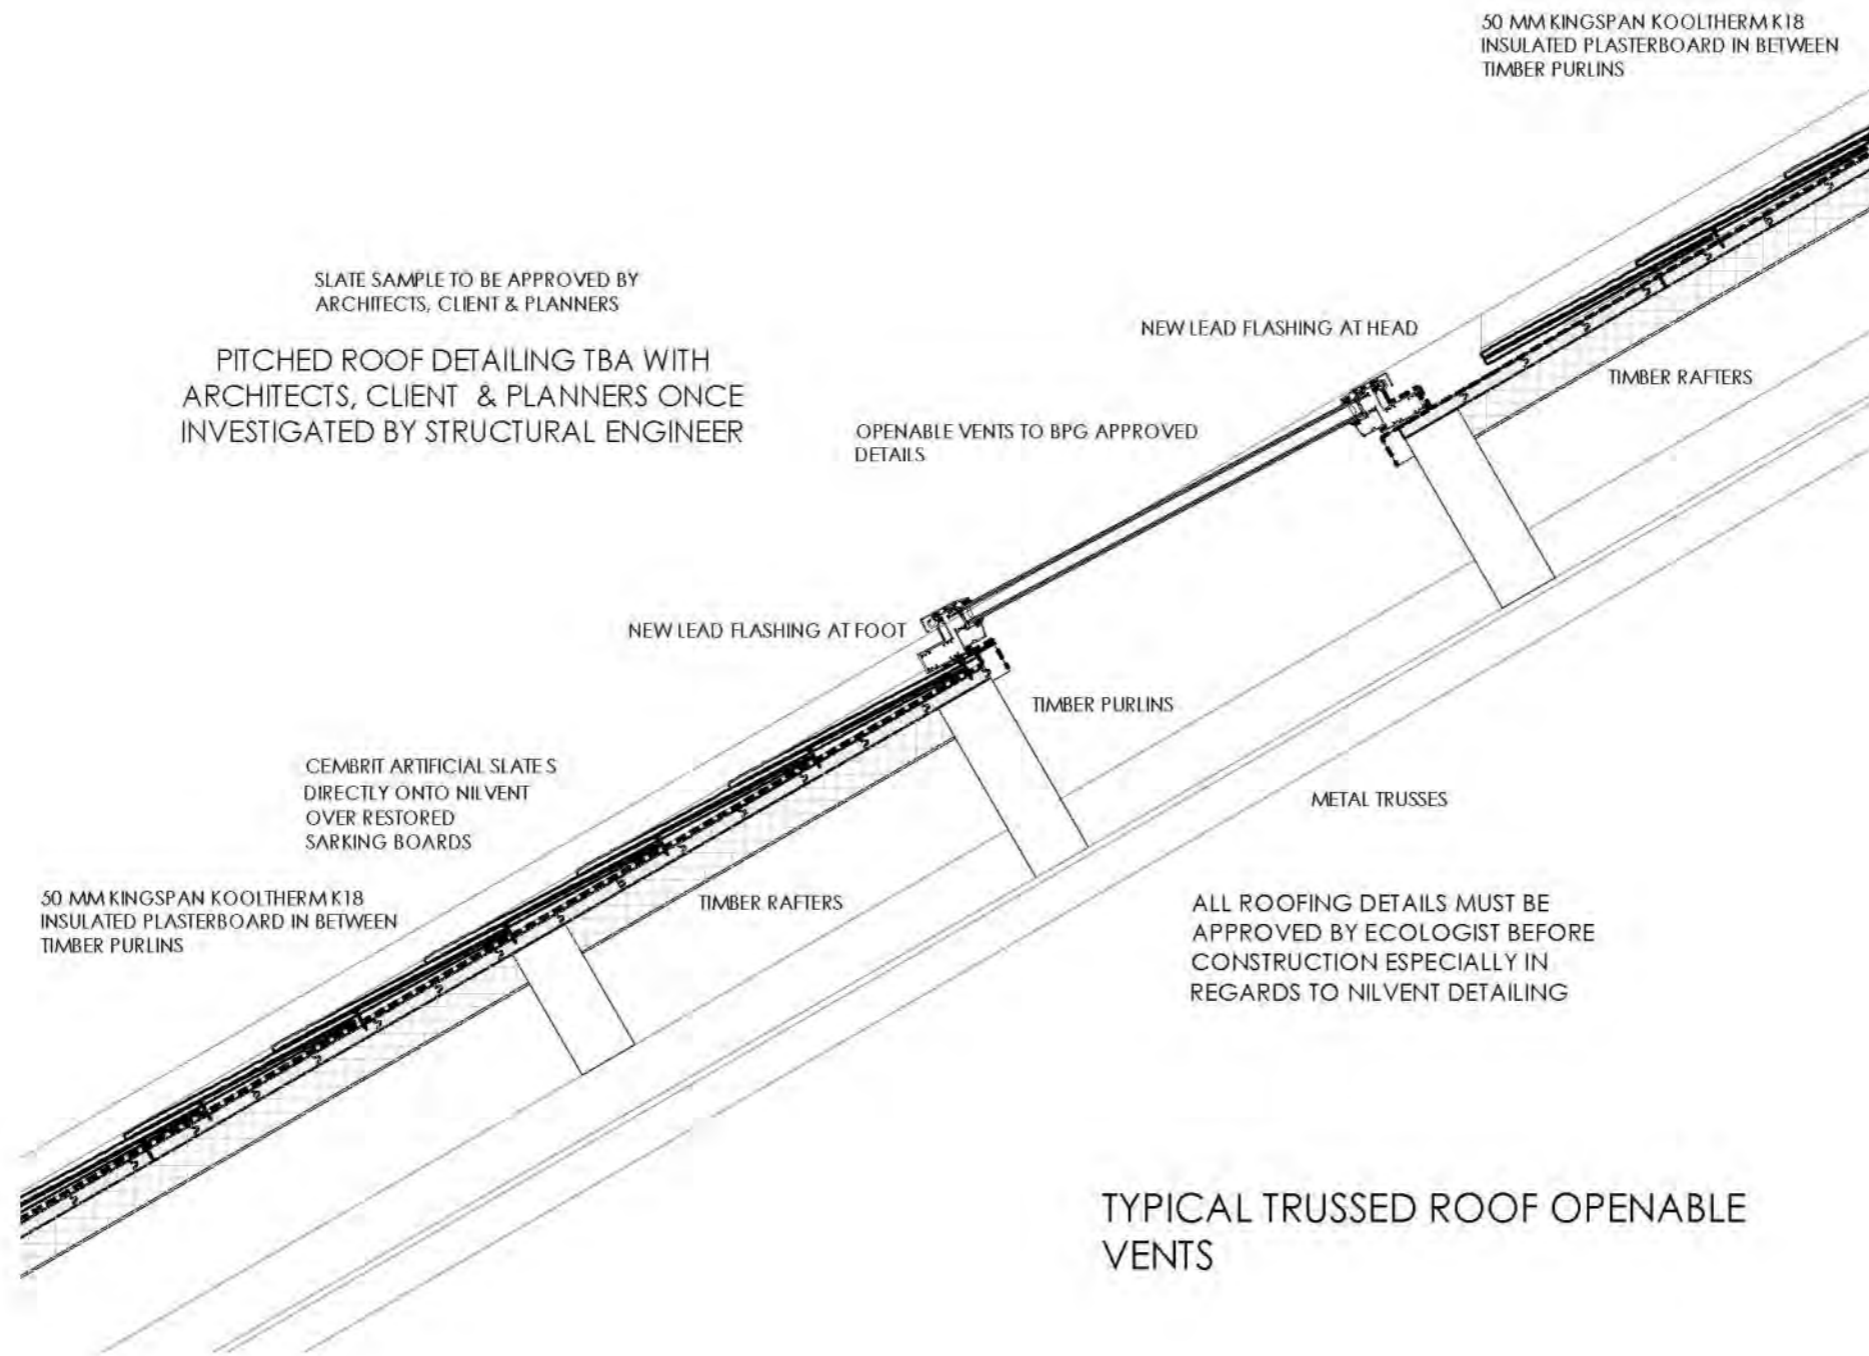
Proposed replacement patent glazing to roofs; new openable vents
